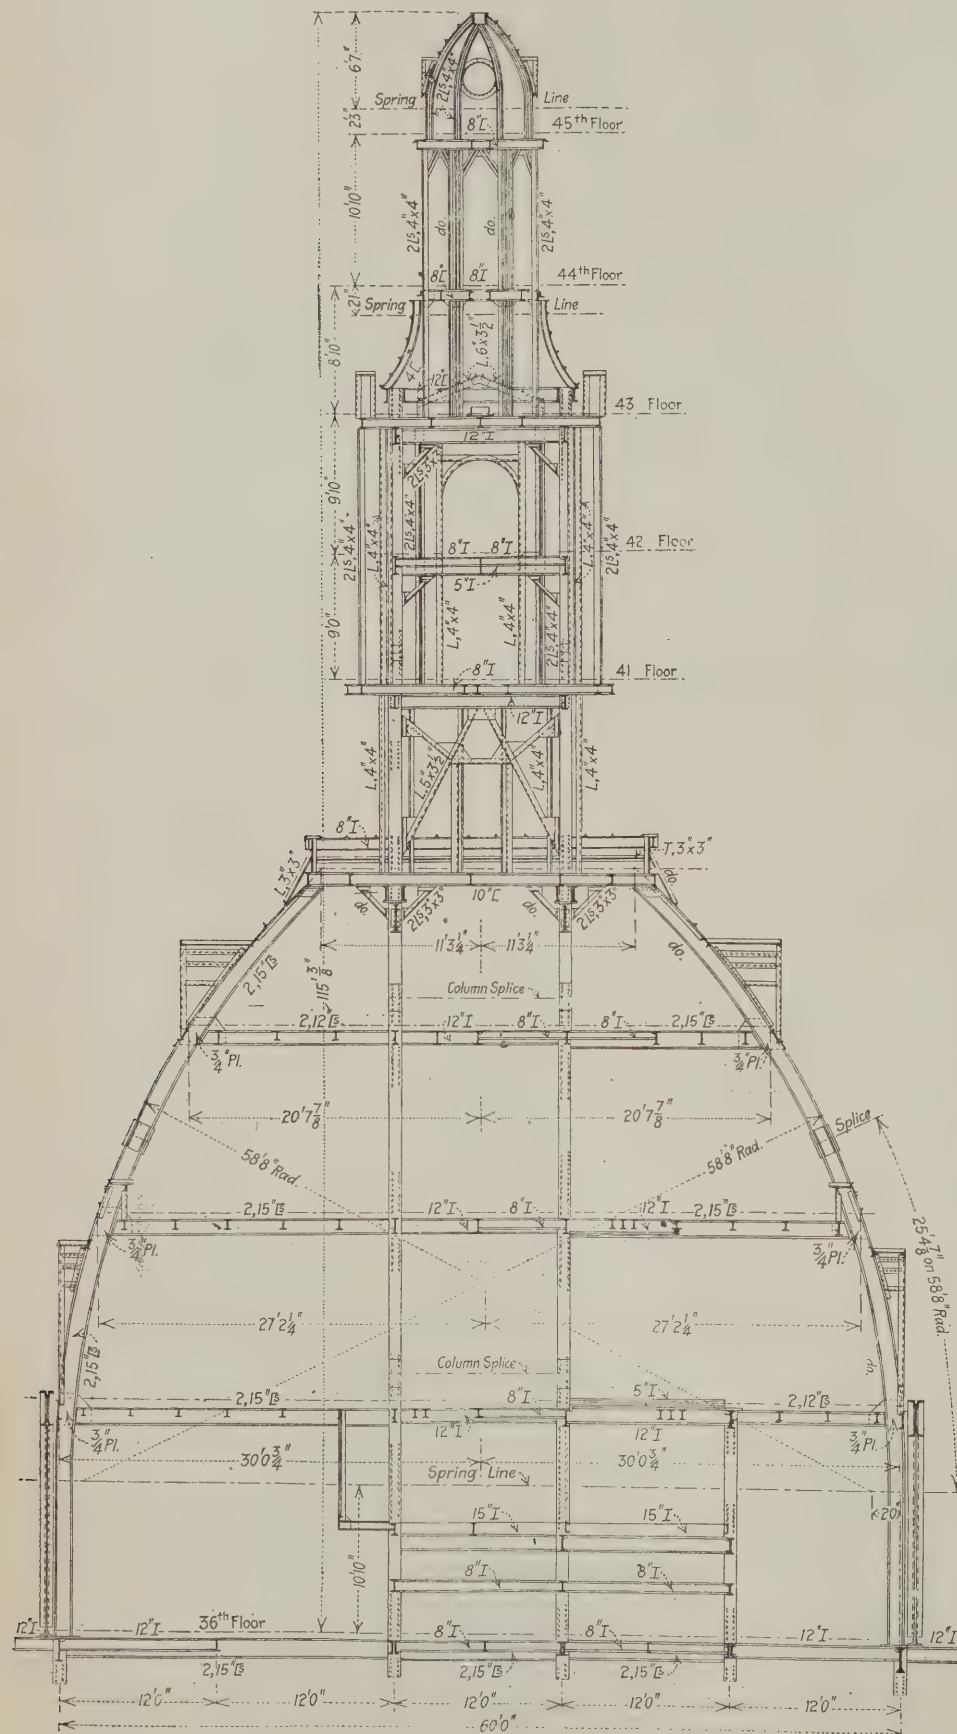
ELEVATION OF CUPOLA OF SINGER BUILDING.
